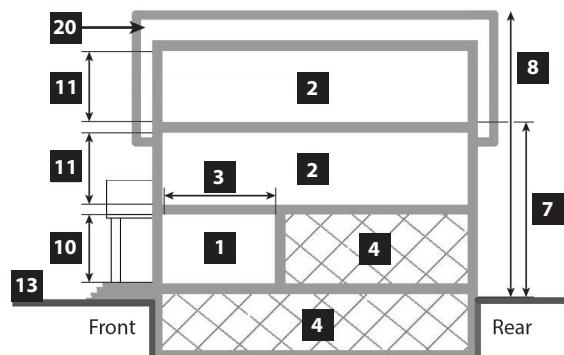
Row building height and use diagram shown with basement and rear building interior parking, porch entry type, and pitched roof type. Not to scale.
